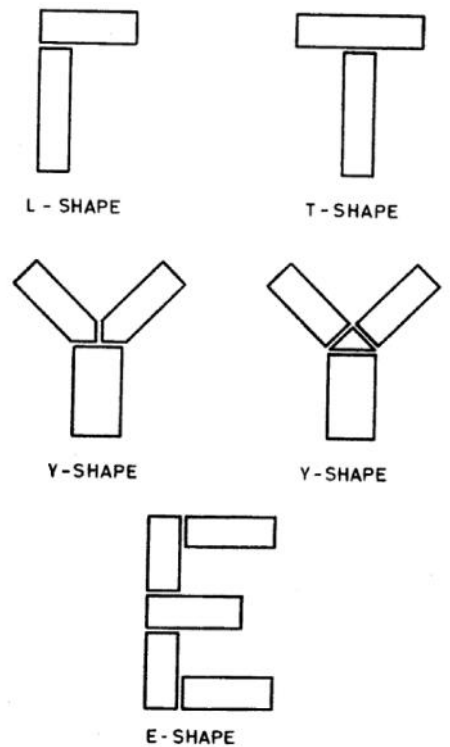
TYPICAL SHAPES OF BUILDING WITH SEPARATION SECTIONS
